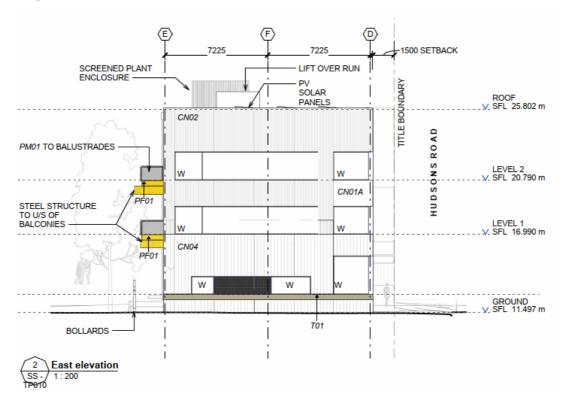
East elevation Industry tenancy 1 in north east corner, Source: NE Plot Proposed Plan – Level 2 TP102 Rev A by Six Degrees Pty Ltd
